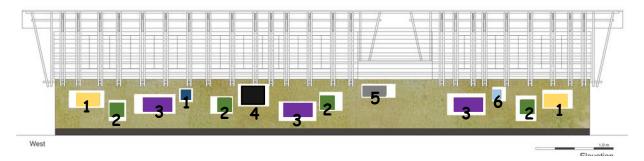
West Elevation: Six different size windows are randomly arranged on the west side. (ArchDaily, 2010)
